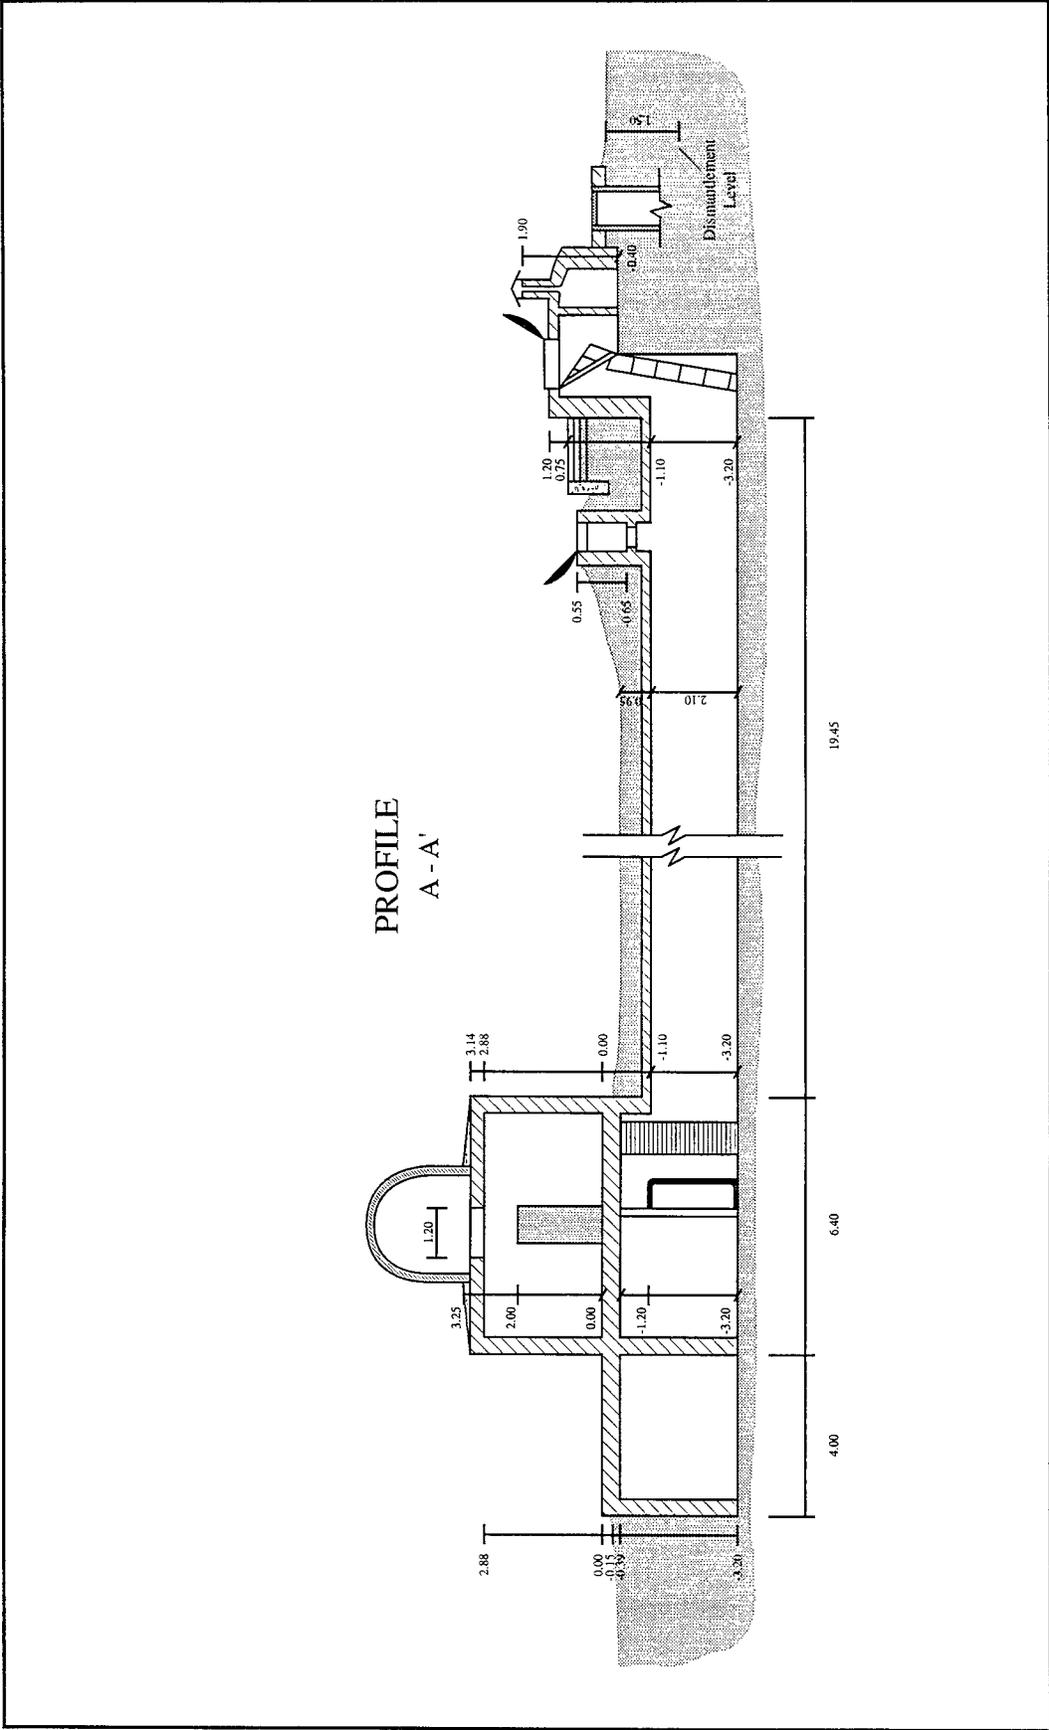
Cross sectional drawing of the "Force Protection" guard house, and associated tunnel and entry structures. Derzhavinsk, Regiment 2, Silo 3. All measurements are in meters.
